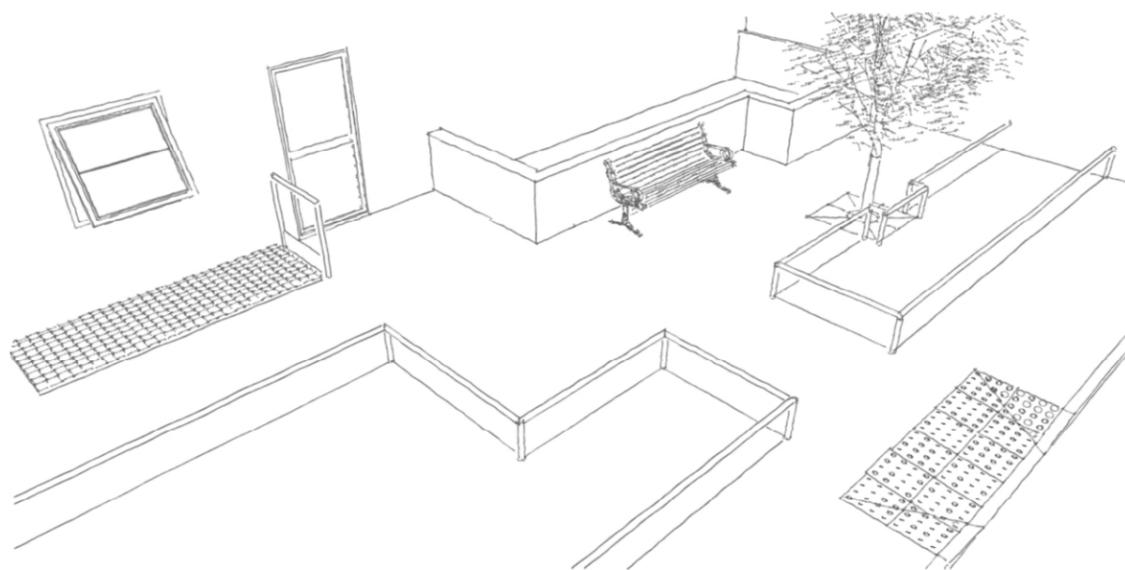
Indicative illustration showing required access arrangement considerations when detailing approach to buildings
